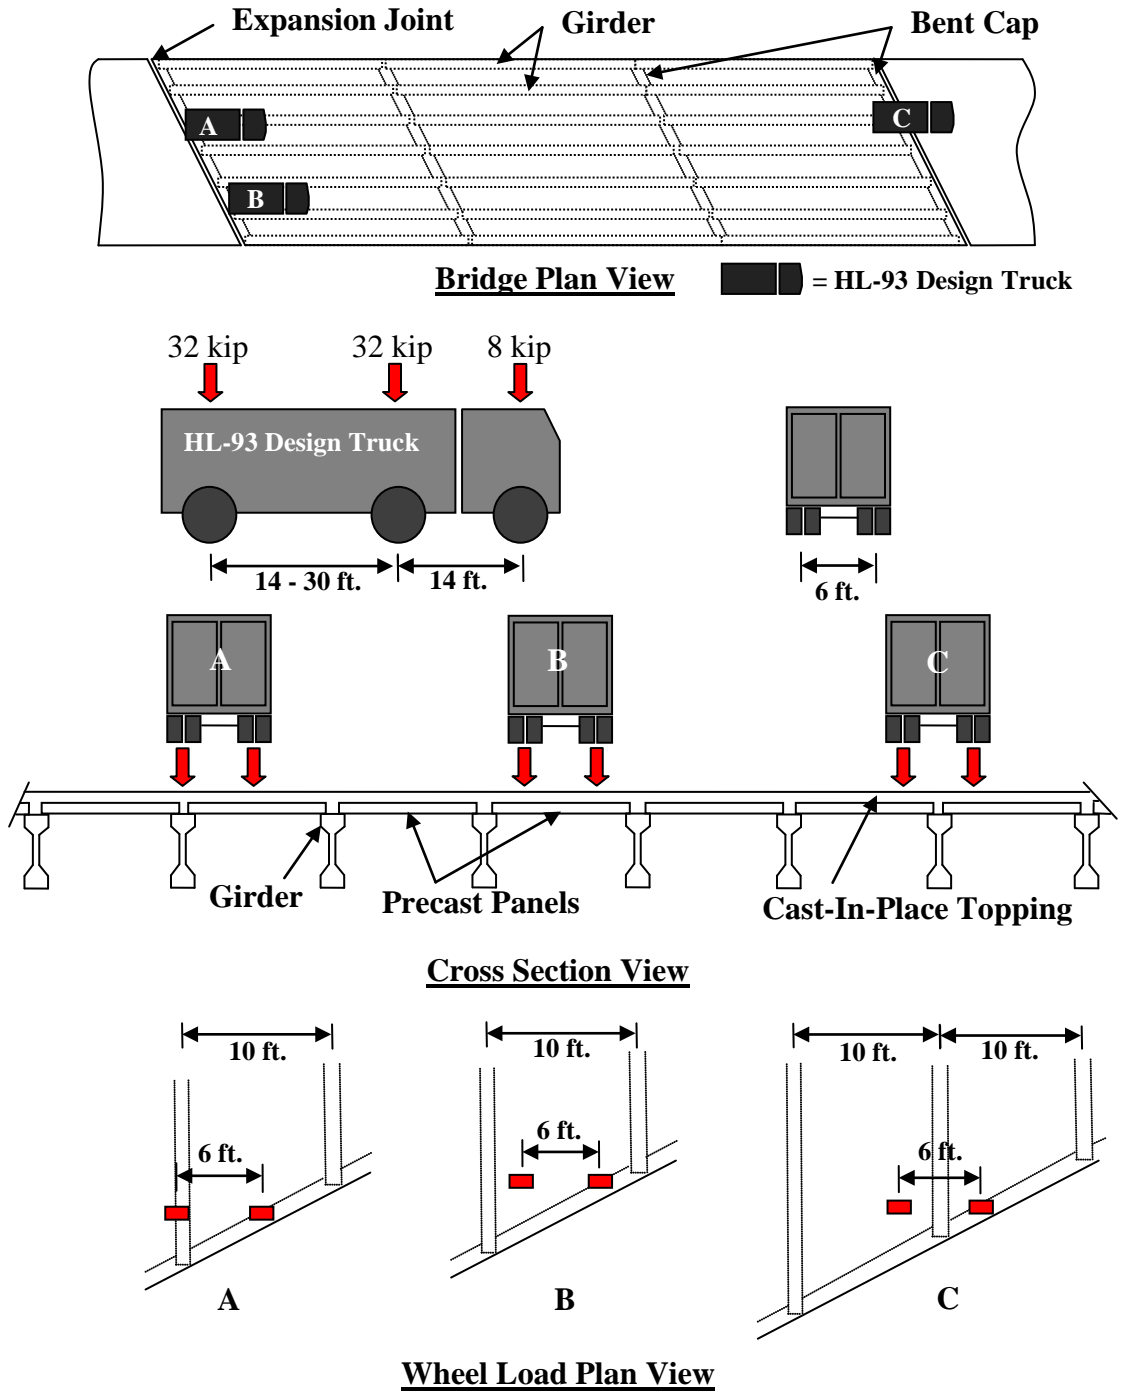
HL-93 Design Truck Loads on Bridge Deck (Boswell 2008)
